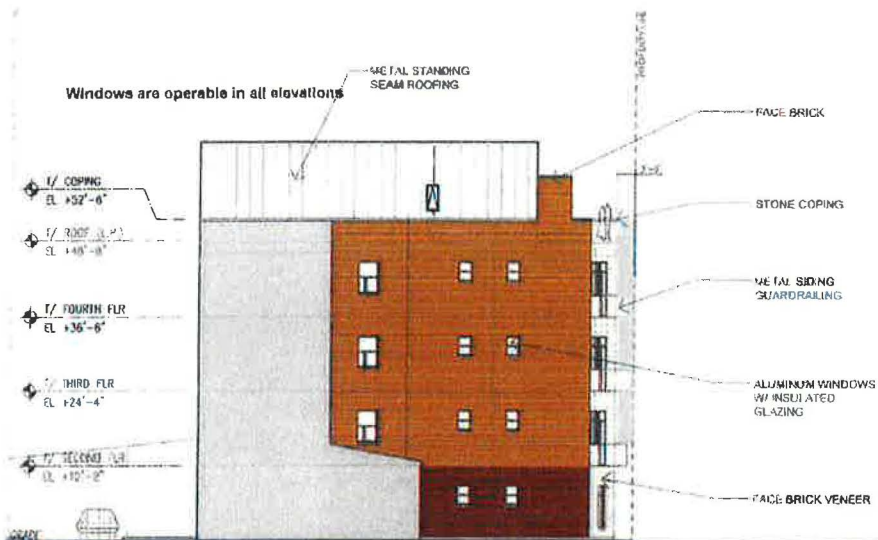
BUILDING ELEVATION - SOUTH (LIGHT WELL)
